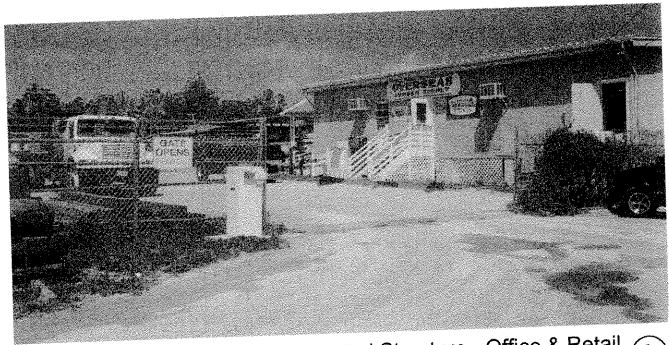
PHOTO - Existing One Story Elevated Structure - Office & Retail 2
